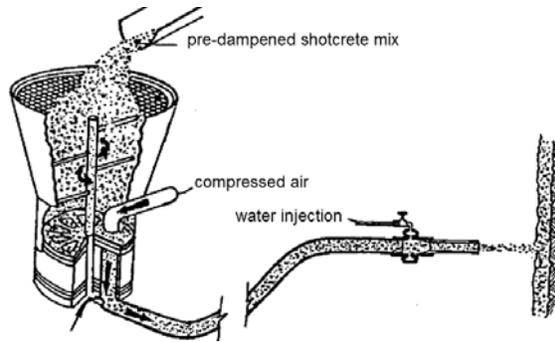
Simplified sketch of a typical dry mix shotcrete system.
